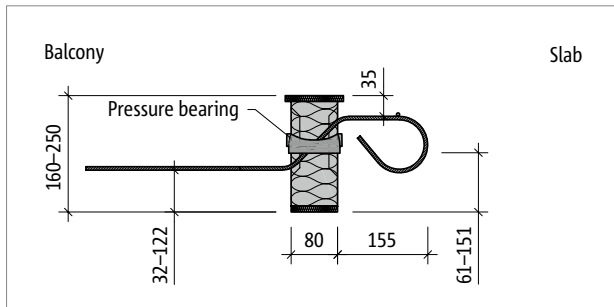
Schöck Isokorb® T type Q-T-W-V1 to V2: product section
